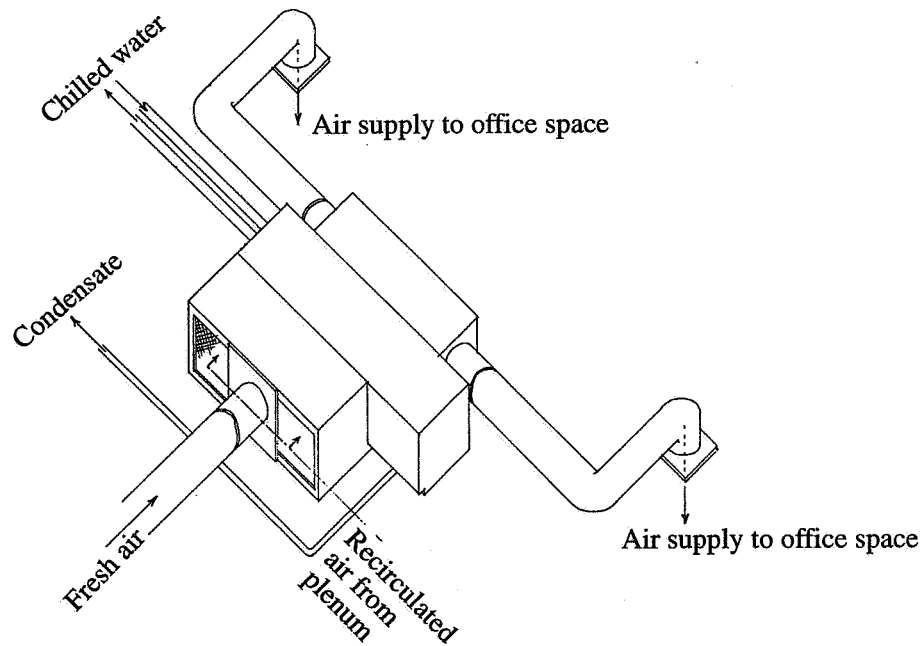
Direct ducting of fresh air to the air entry point of unit air handlers on floor 2 of building C.
